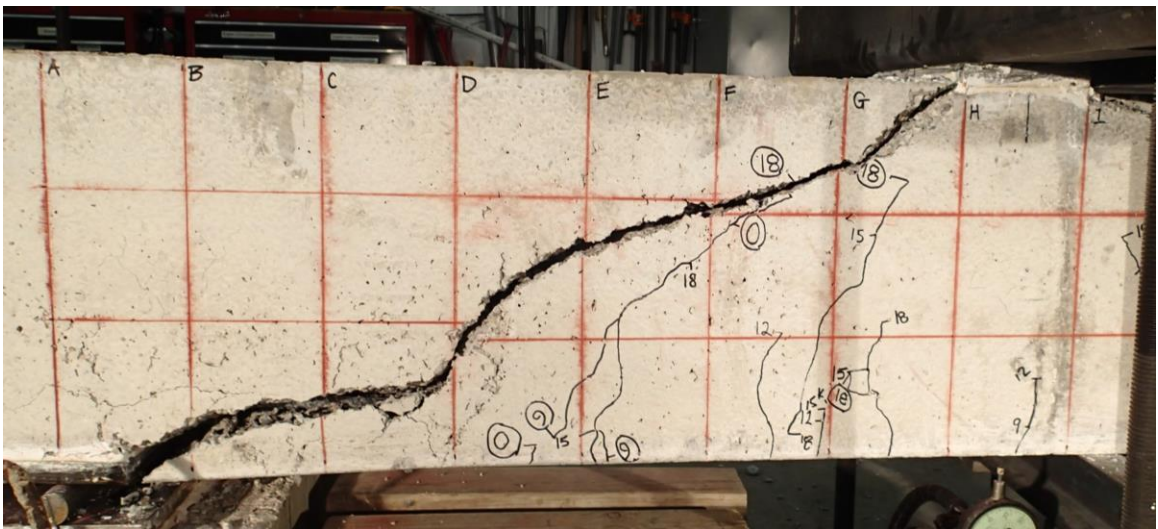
Specimen J-2: North Side Failure Inclined Crack
